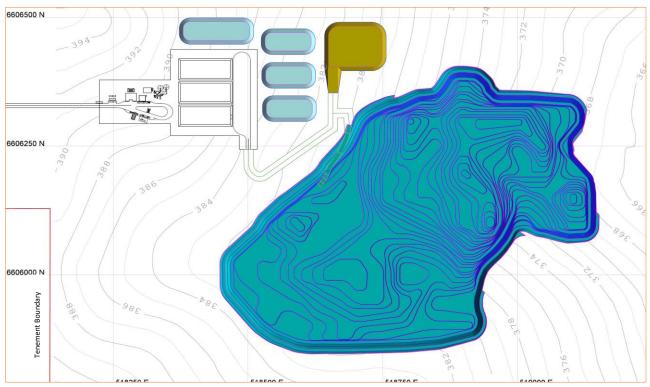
Cadoux kaolin project – potential open pit outline and mine infrastructure layout
